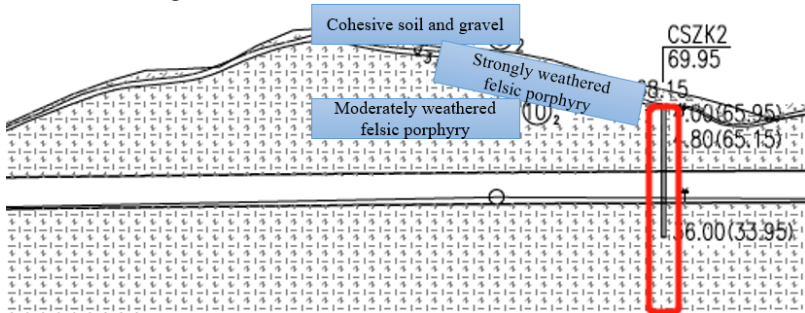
Vertical section at the intersection of electric tower and tunnel.
